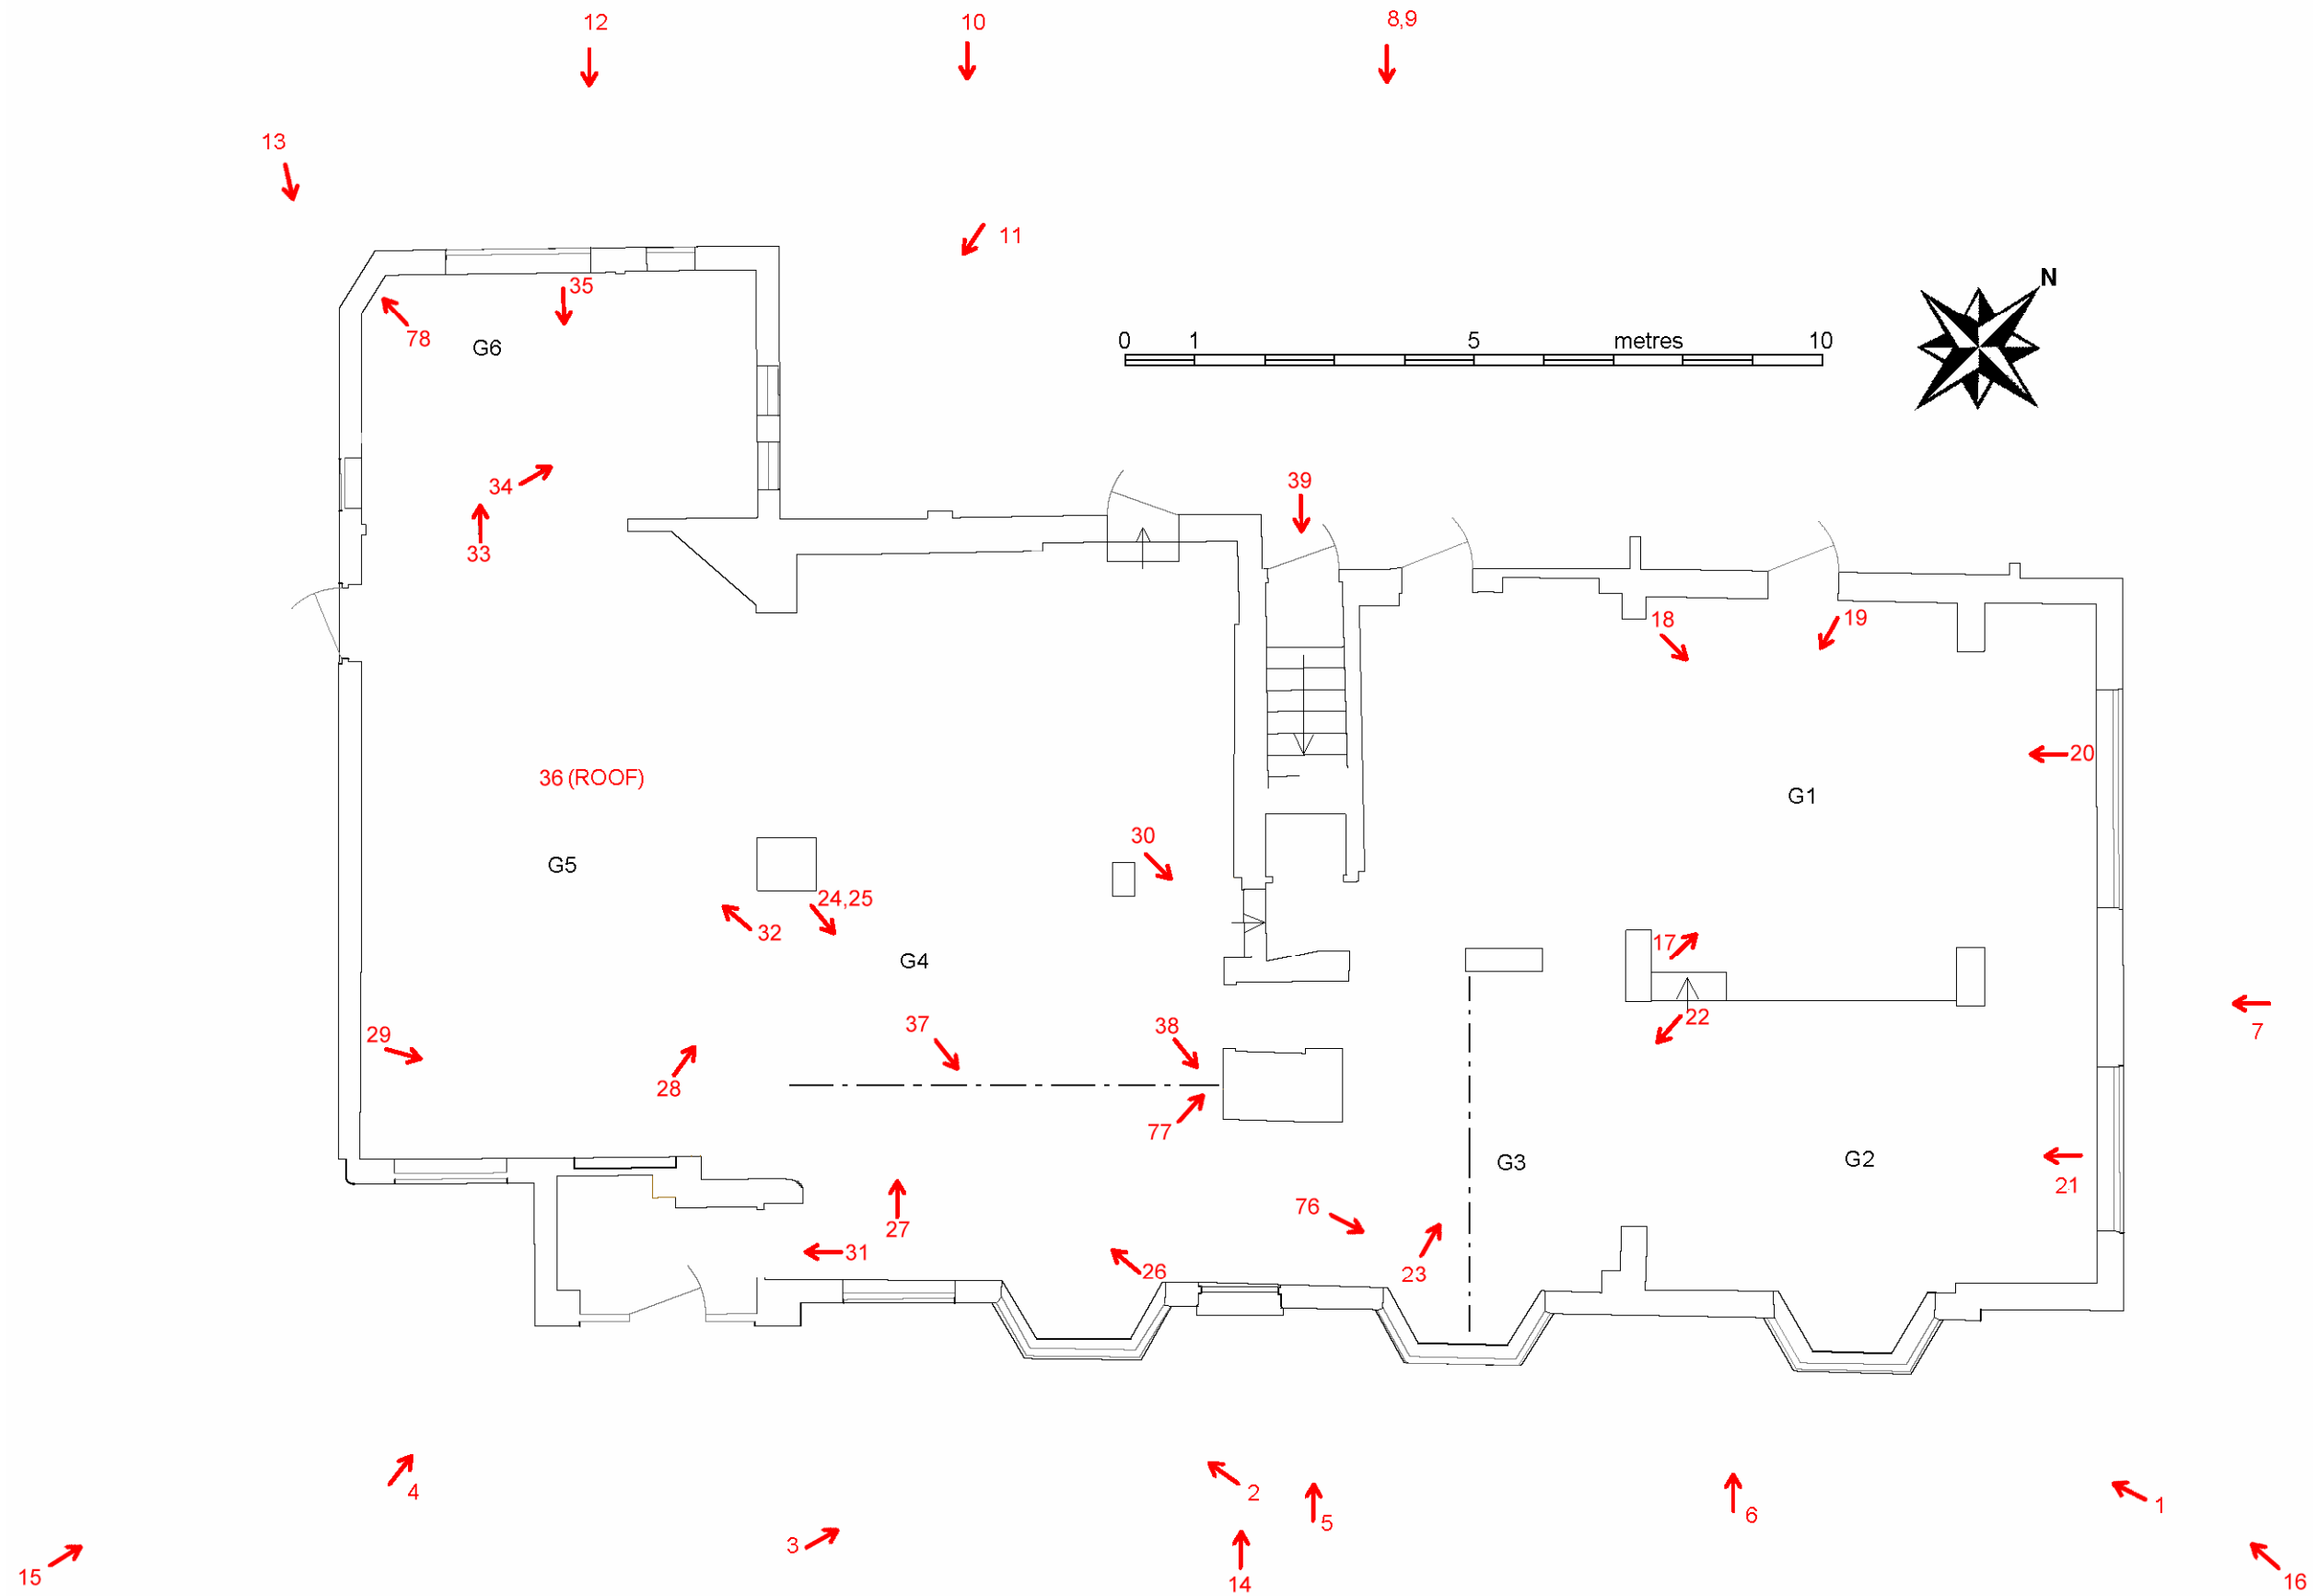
Ground floor plan at survey, with photo locations (scale 1:100)
